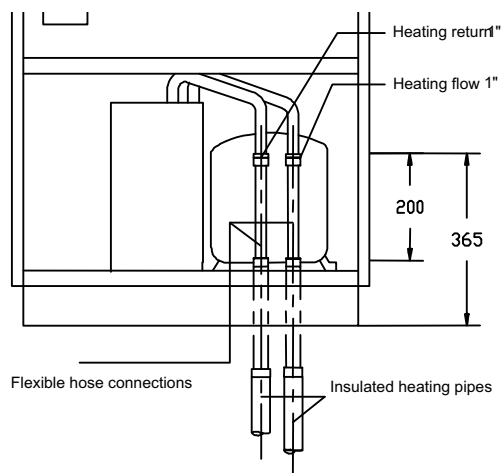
Example of how a heat pump is integrated when installed outdoors
